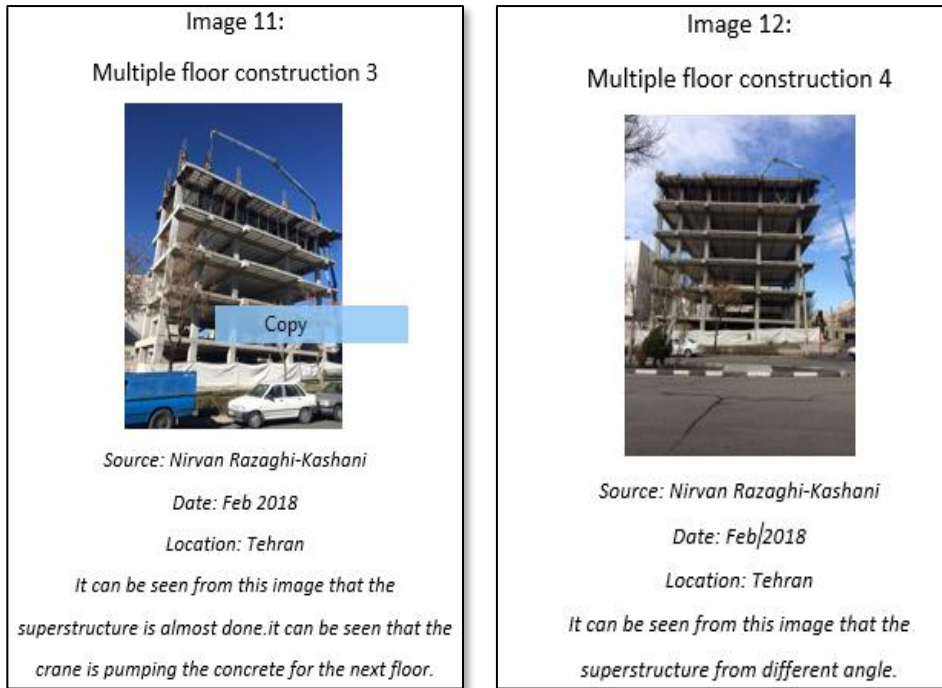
Images of a complete reinforced concrete structural framework on a building in Tehran, (source: Nirvan Razaghi-Kashani).
